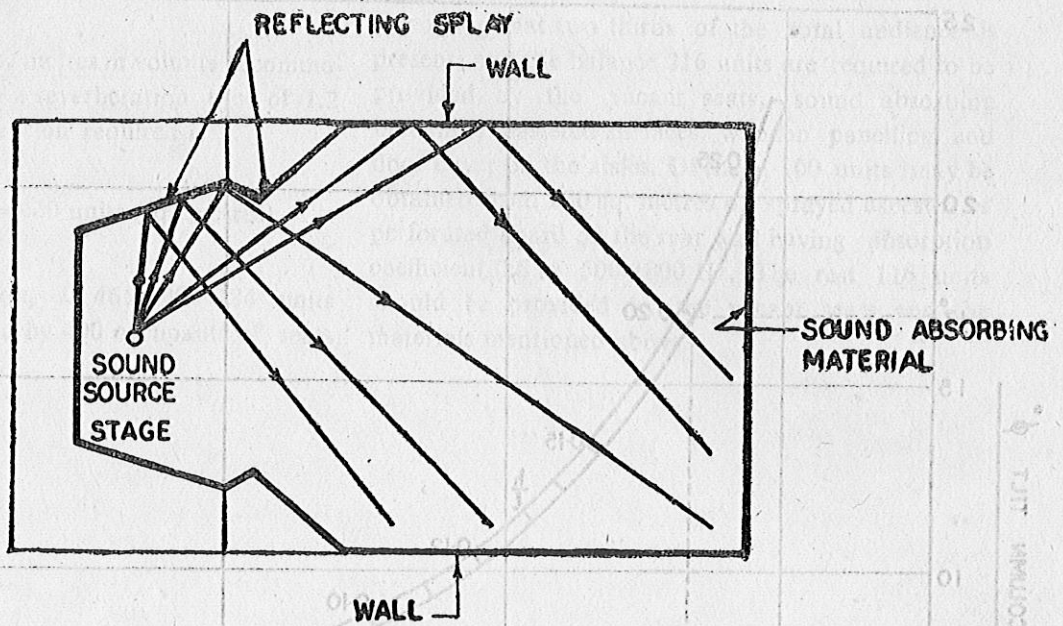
PLAN OF RECTANGULAR HALL SHOWING USEFUL REFLECTIONS FROM THE WALLS PLUG AND STAGE INSETS.
